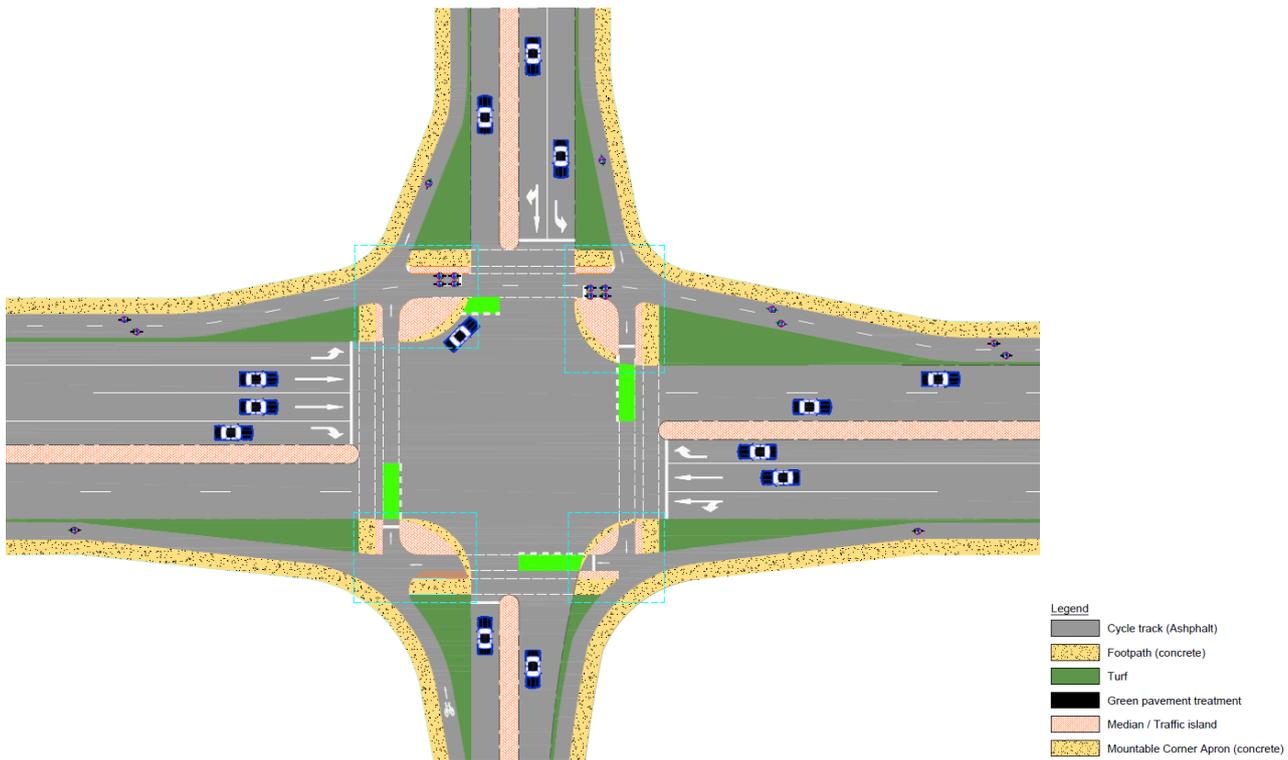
Typical Layout at Signalled 4-way Intersection
